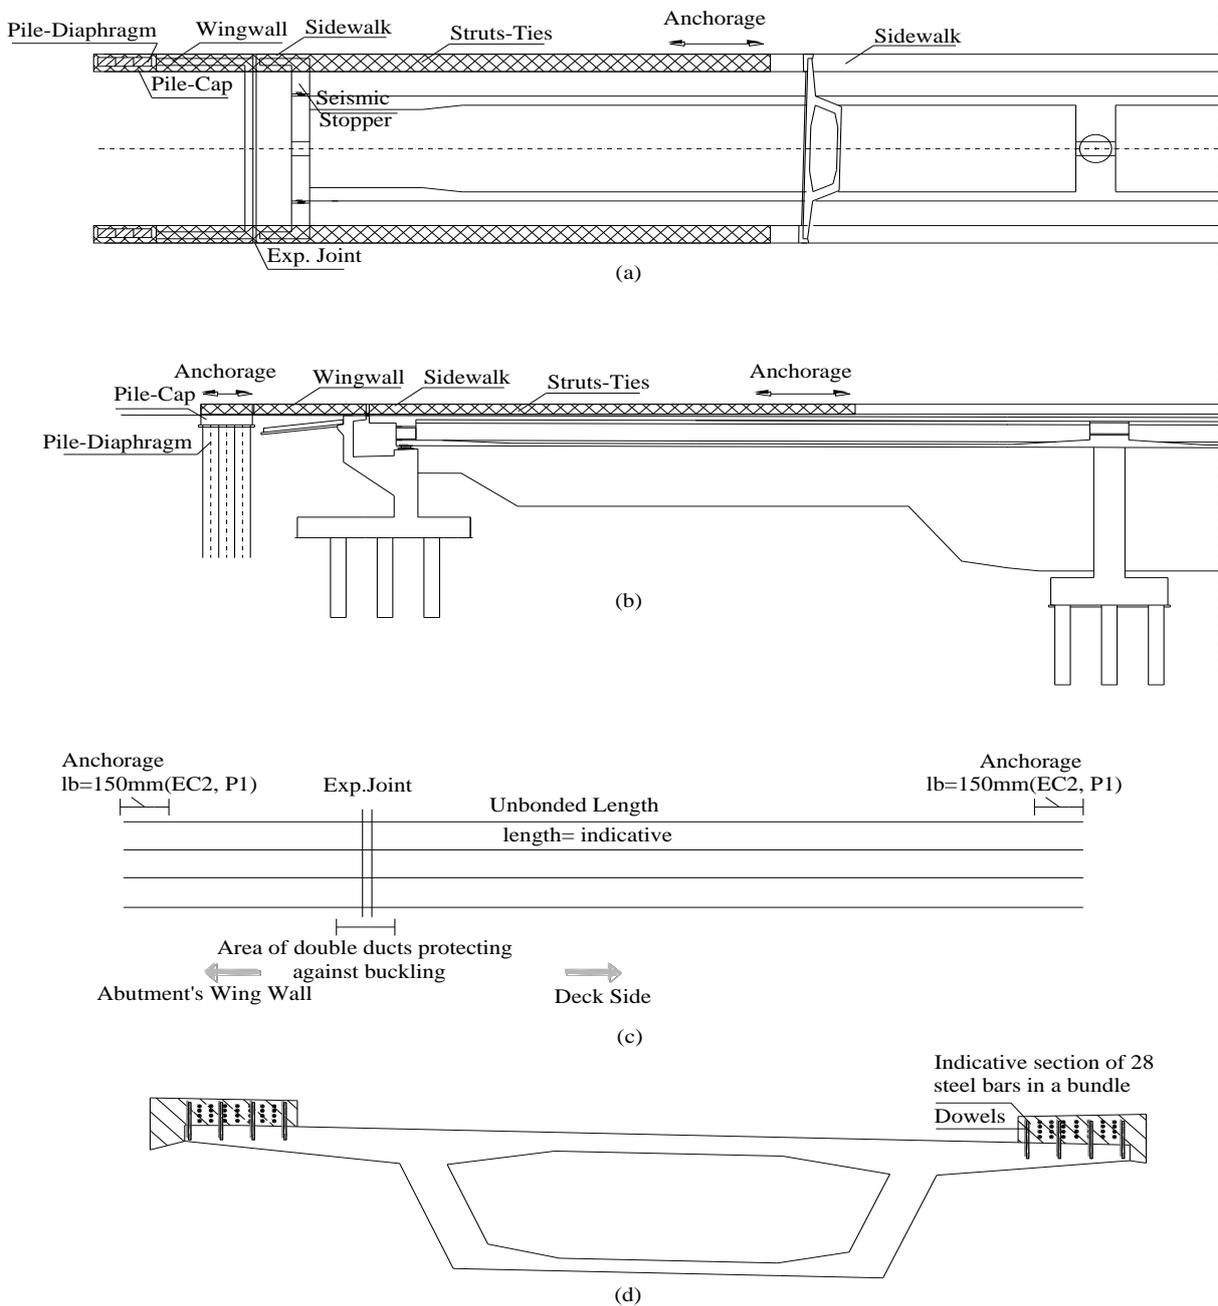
a) Plan of the bridge, b) Longitudinal cut of the bridge, c) Longitudinal Detail (indicative) of the steel bars, d) Detail of sidewalks on the cross section of the deck (indicative)
